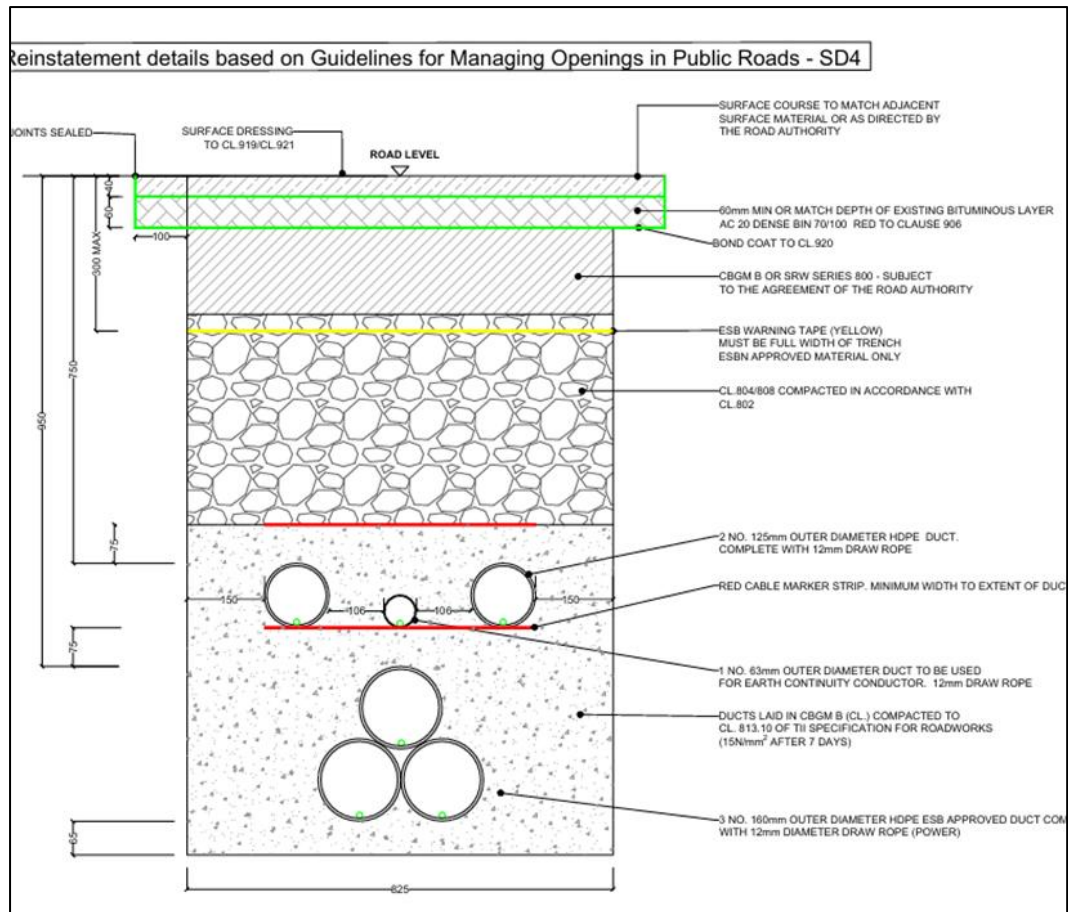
Typical Installation in Roadway for 110kV UGC Grid Connection
